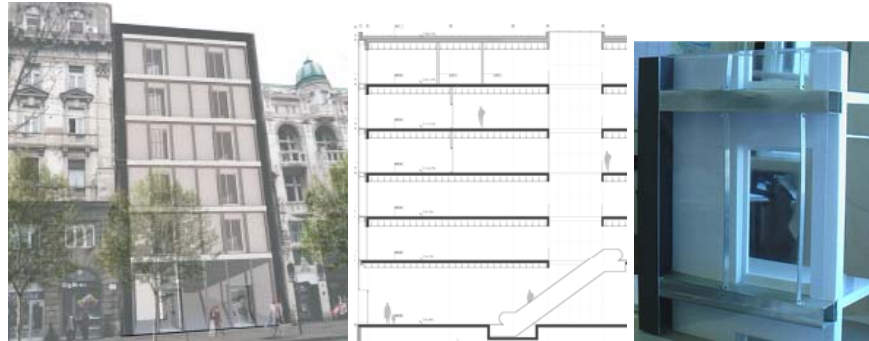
Elevation, cross-section and model of the street facade of Model 2
